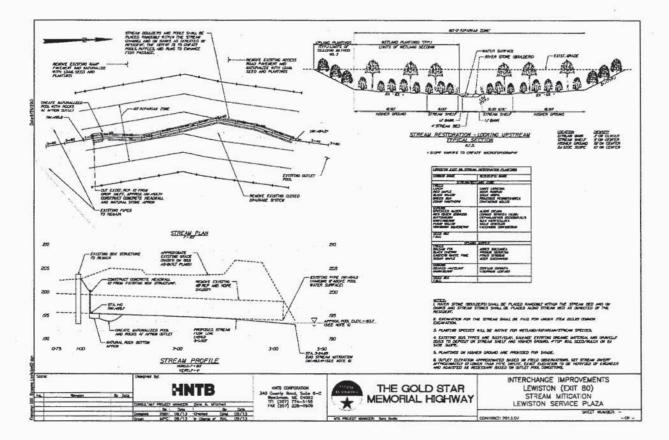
Former Lewiston Service Plaza - Proposed Stream Restoration Plan.
